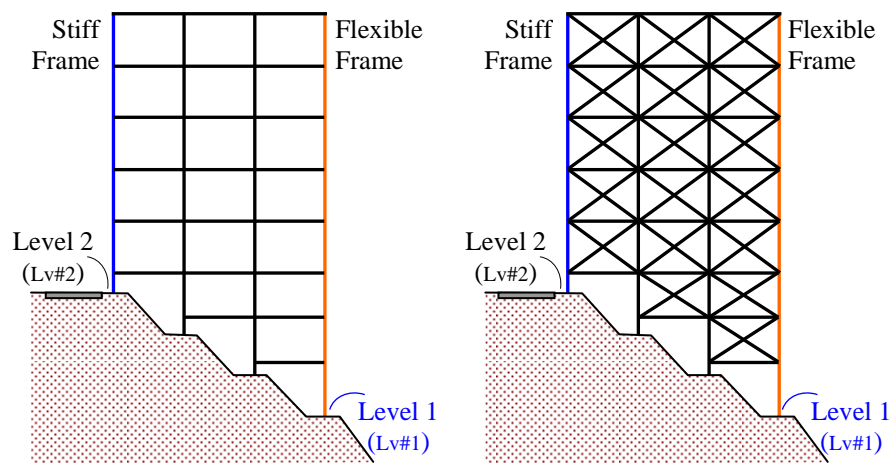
Elevation of building 303F and 303IN (with infills modelled)
